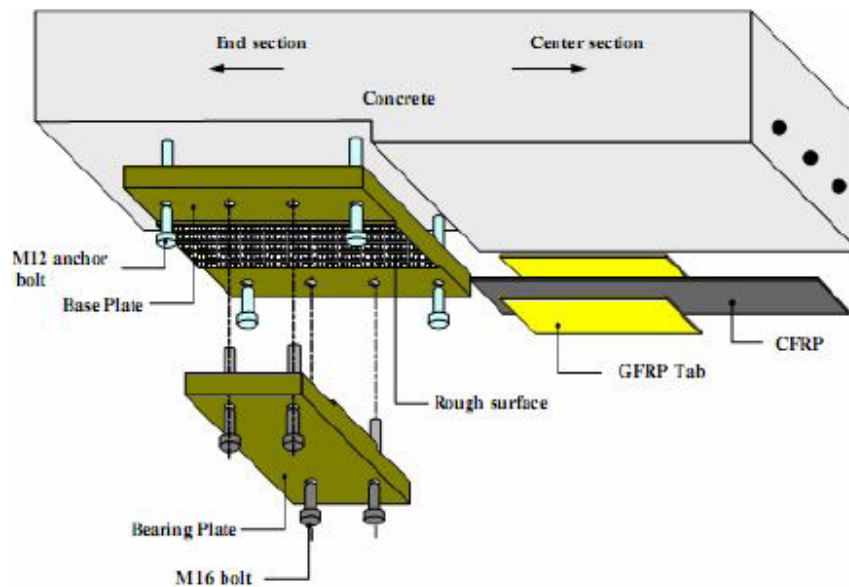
Detail of the anchorage system (Dong et al. 2009)
